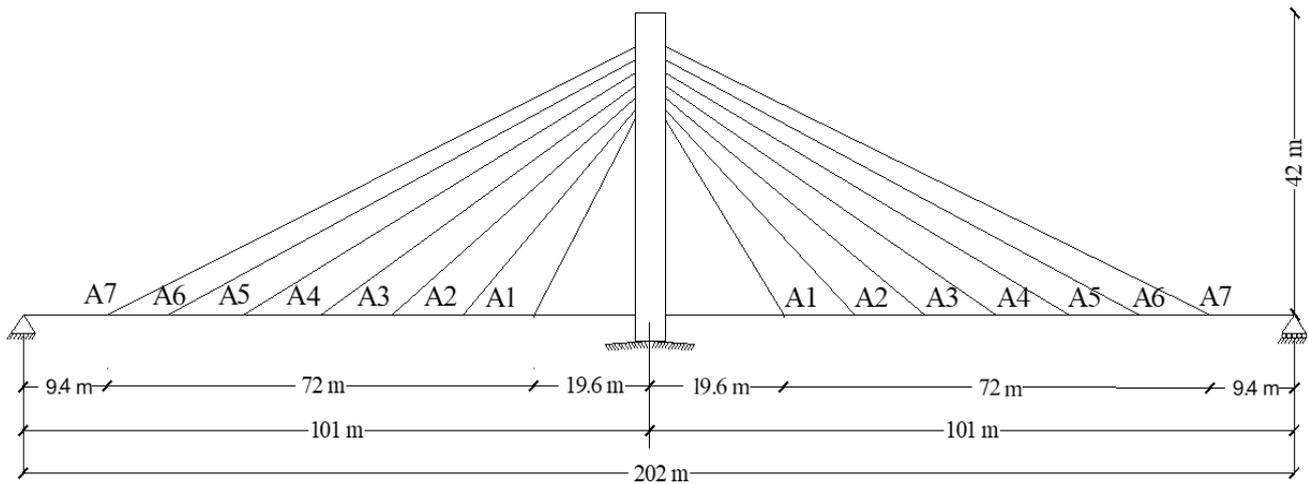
Manavgat cable-stayed bridge(<https://structurae.net/en/structures/manavgat-antalya-bridge>)
